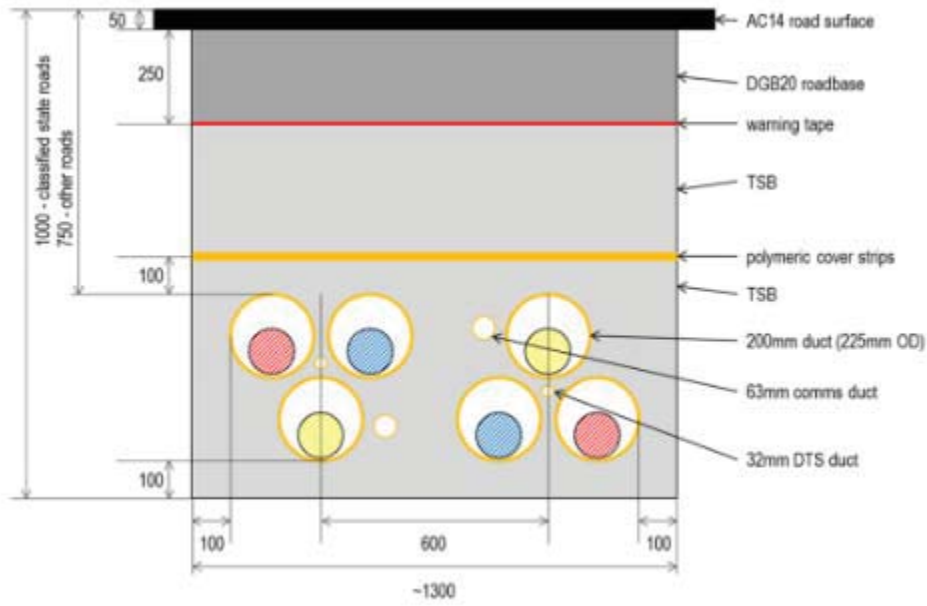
Typical trench cross-section 33-132kV underground cable
